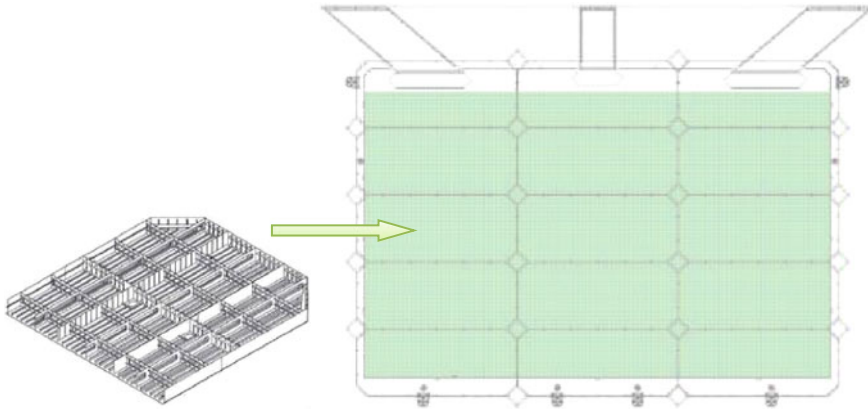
Plan view of floating platform consisting of 15 pontoons (each measuring 40 m \times 16.6 m \times 1.2 m) connected together and three access bridges
